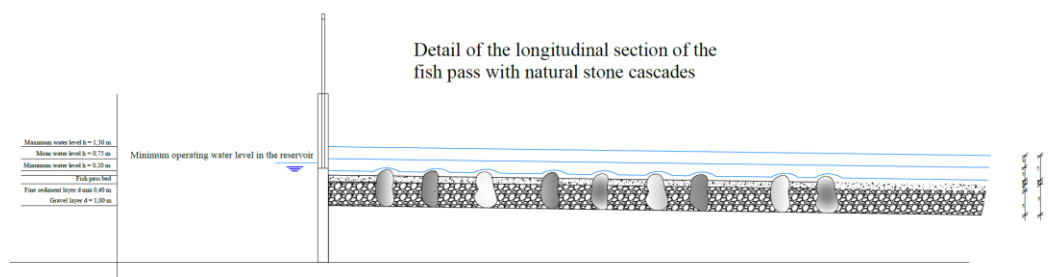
Detail of the longitudinal section with natural stone cascades (drawing by author).
